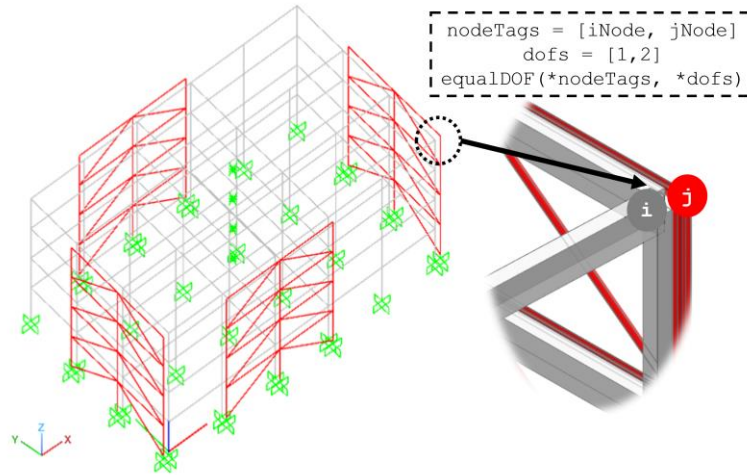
3D view of the FE model of the existing structure equipped with the steel exoskeletons
